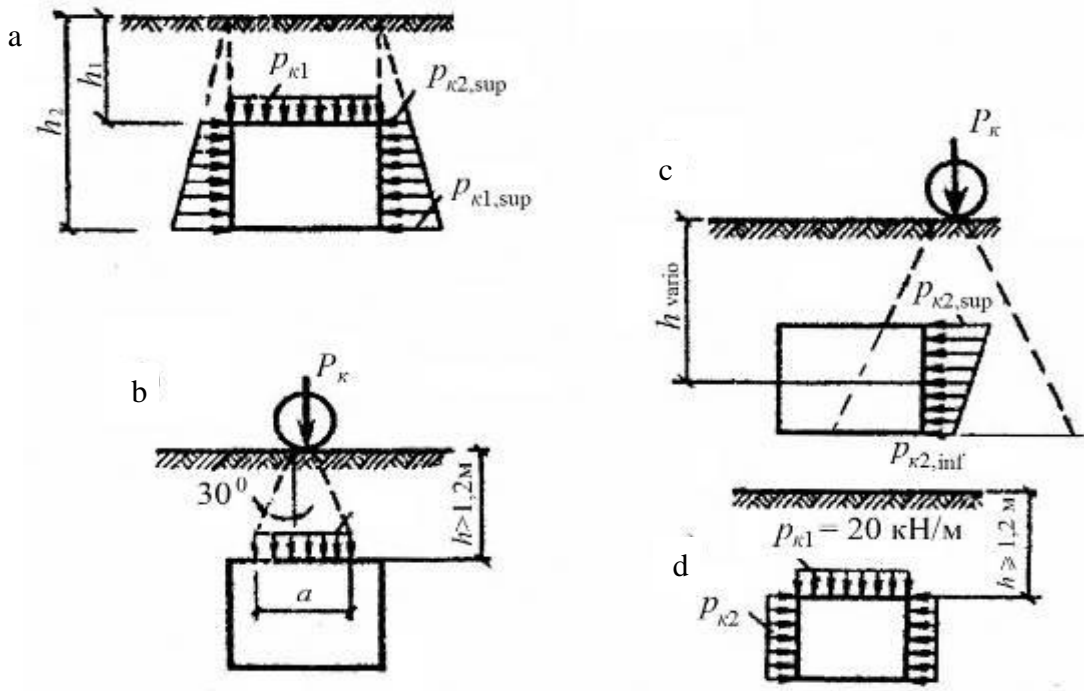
Load diagrams for underground channels and tunnels:
